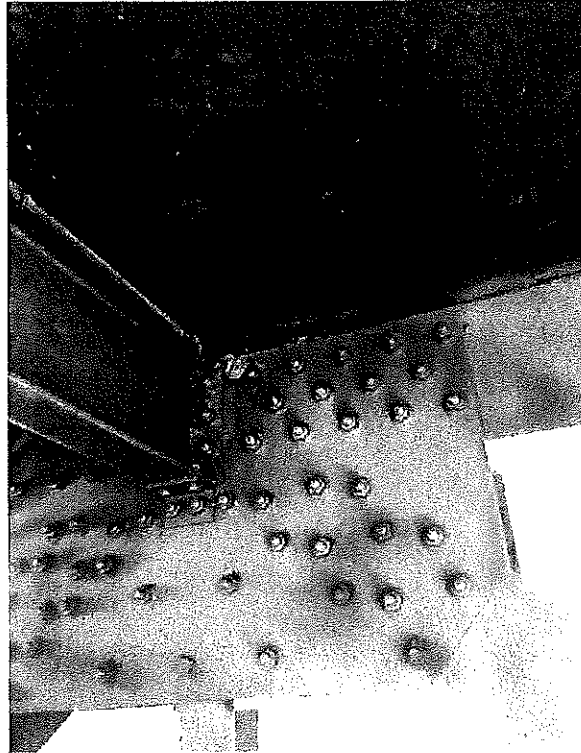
Yapei Bridge. Detail of truss upper node and connection to Intermediate diaphragm.
